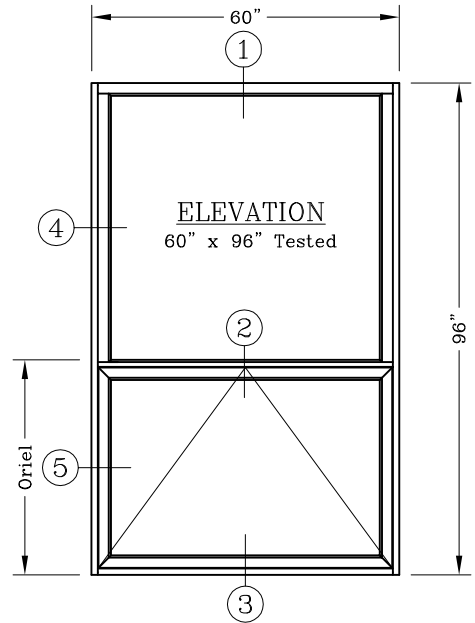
/2 Scale – For Custom Size Drawing Contact Graham
